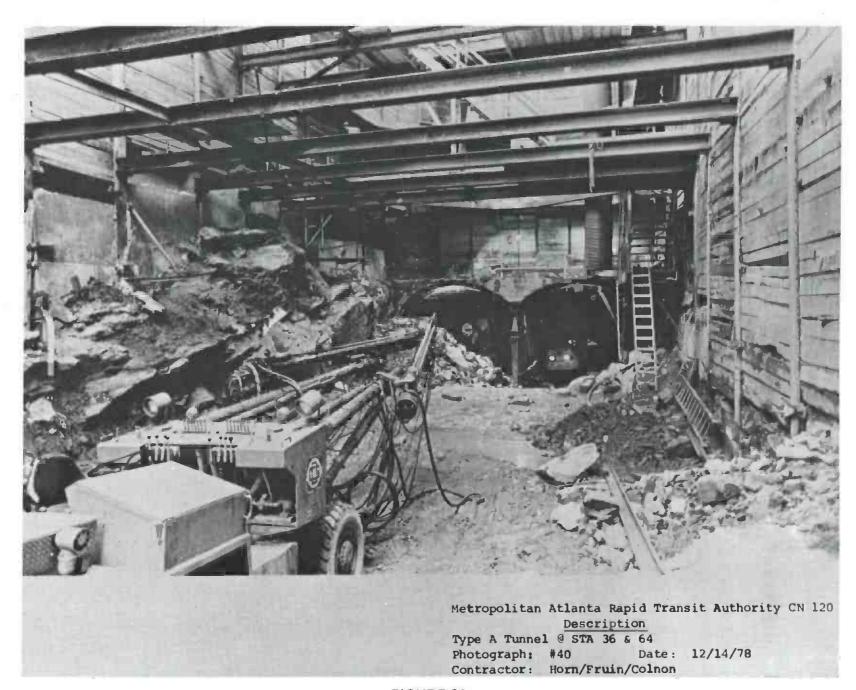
WHEN EXCAVATION IS COMPLETE, TRANSIT CONSTRUCTION PROCEEDS WITH LITTLE EFFECT ON THE UTILITY FACILITIES SUPPORTED ABOVE
